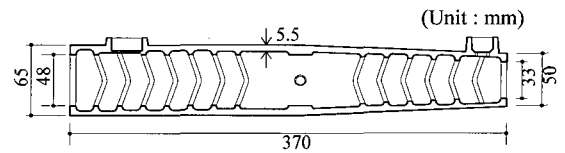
Section of cast splice sleeve used in test of H.Kim (D25 rebar)
